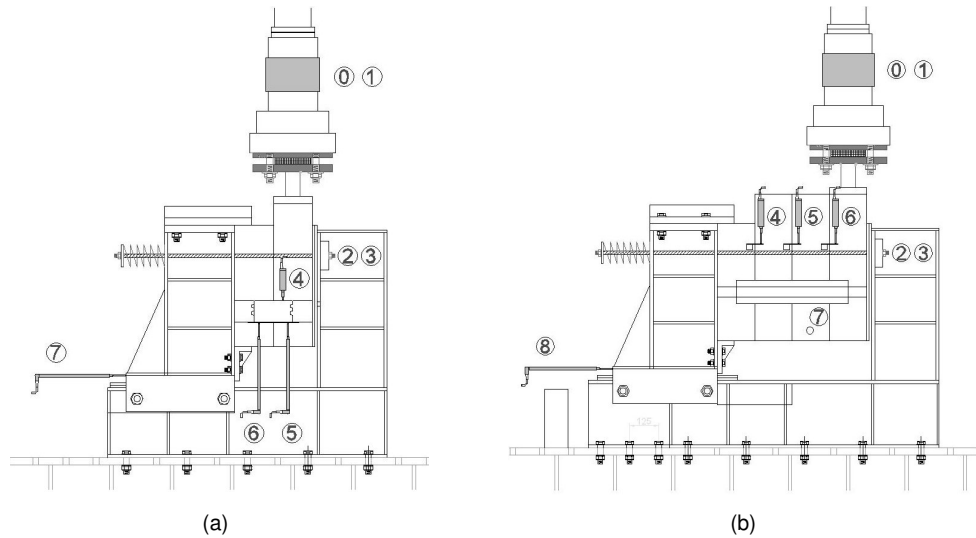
Measurement setup: (a) corner joints - (b) dovetail reinforce
